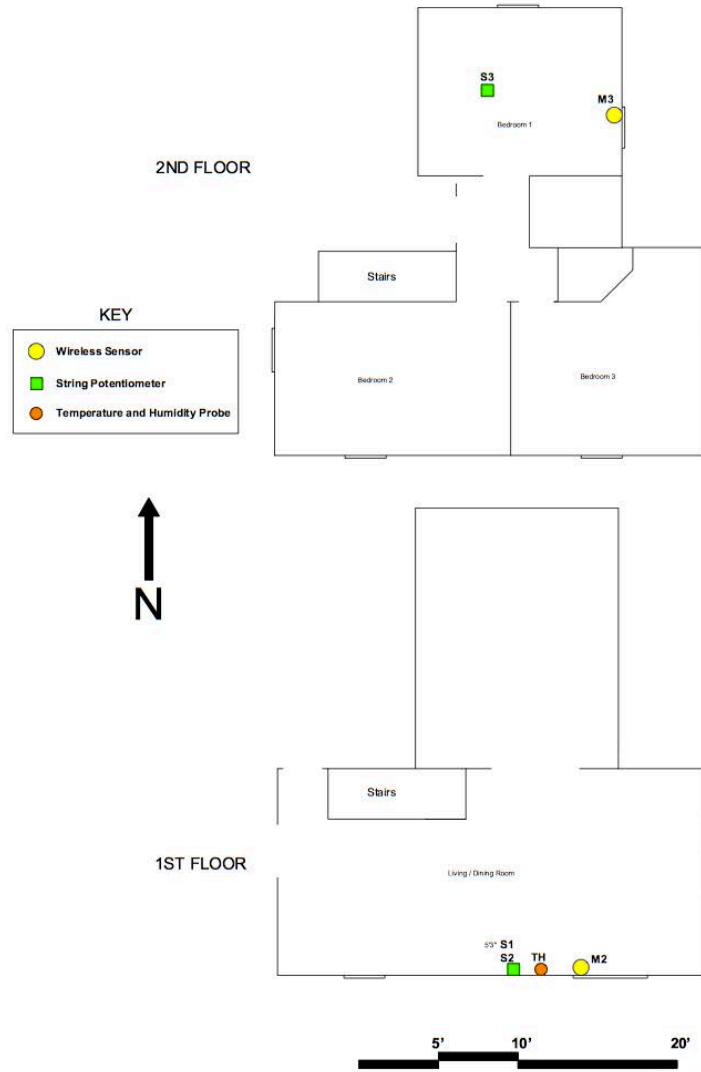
Plan view of the first and second floors of the test house showing the location of the interior nodes (yellow) Temperature and humidity sensors (red) and crack sensors (green: 1 & 2 on south wall and 3 on second floor ceiling).
